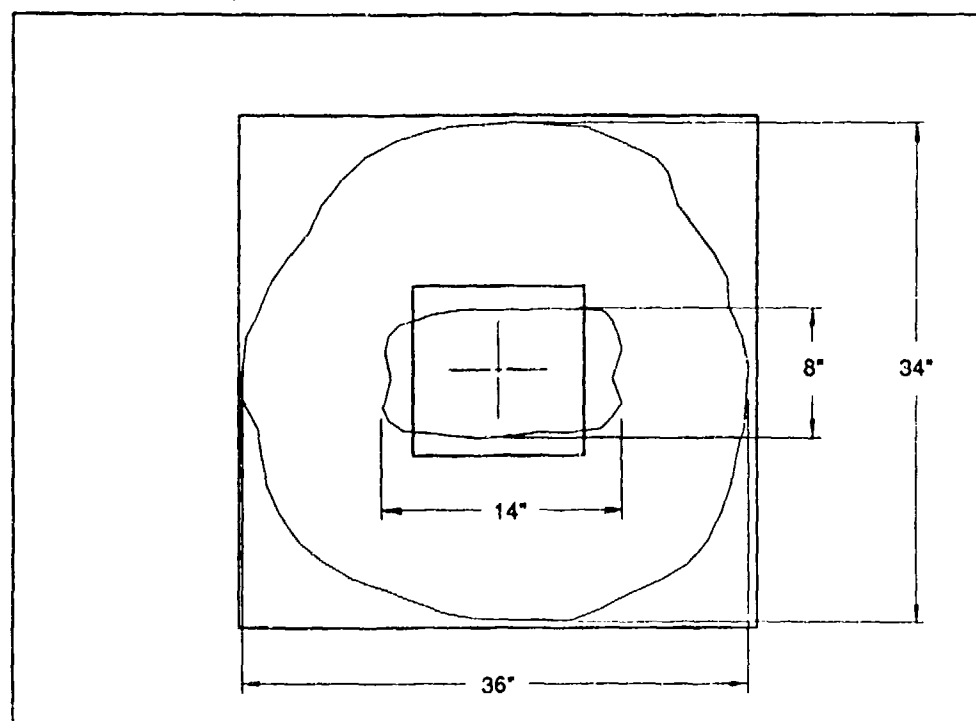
A Schematic of Test 12 Wall Damage (Type A, 2.8-Pound Equivalent Charge).
